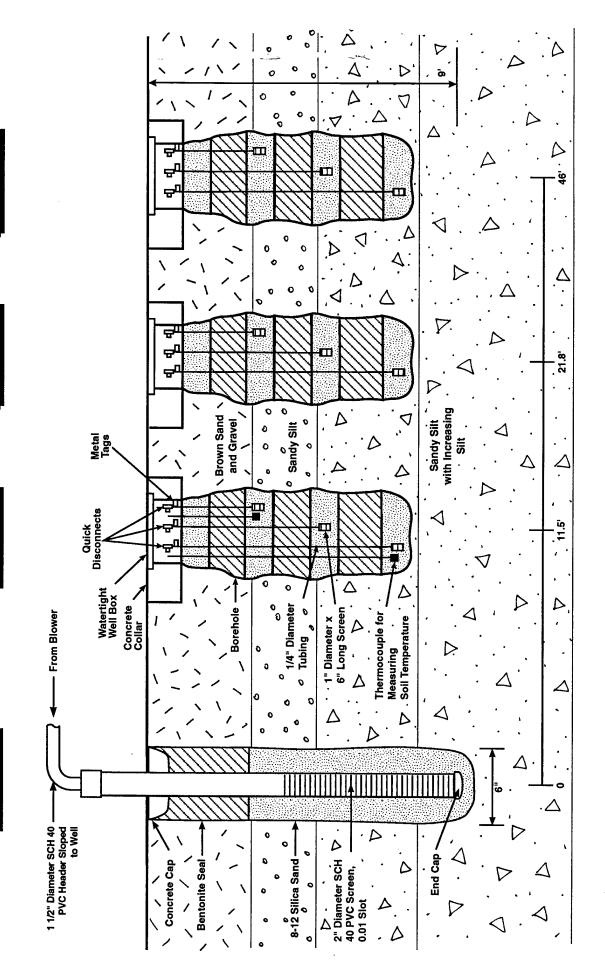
Cross Section of Vent Well and Monitoring Points at the Campion POL Tank Site Showing Site Lithology and Construction Detail (not to scale)
